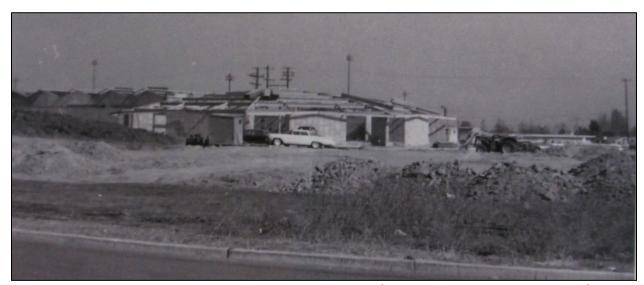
The new library under construction in 1960-1961. (Source: Pleasant Hill Library archives)
